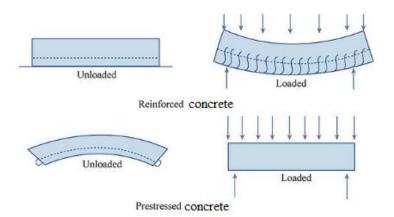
Compare between pre-stressed concrete and reinforced concrete
